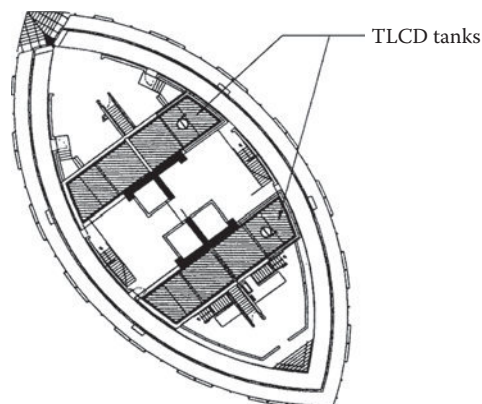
Tuned liquid column dampers (TLCD), Wall Center, Vancouver, BC.
